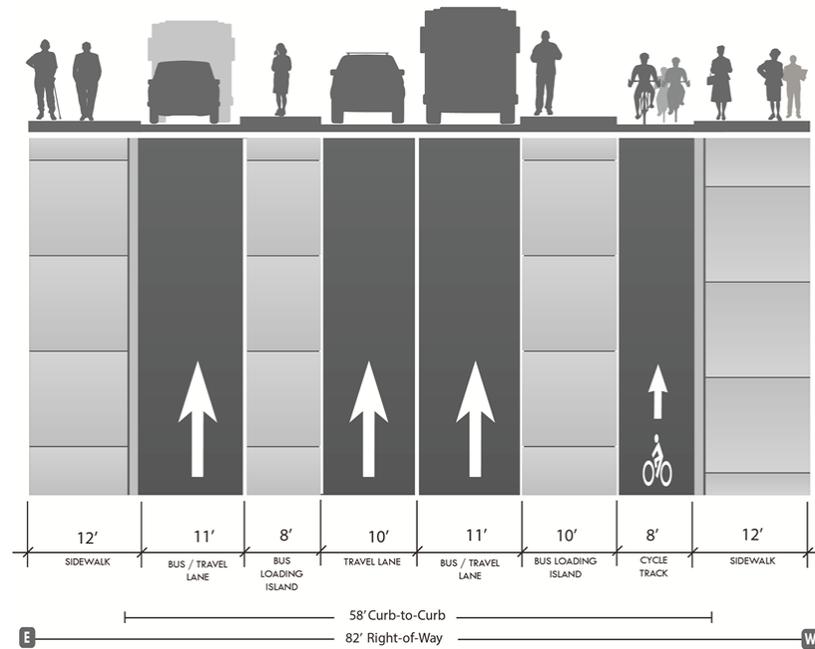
8TH STREET AT MARKET STREET, FACING SOUTH – POTENTIAL TRANSIT FIRST ALIGNMENT
